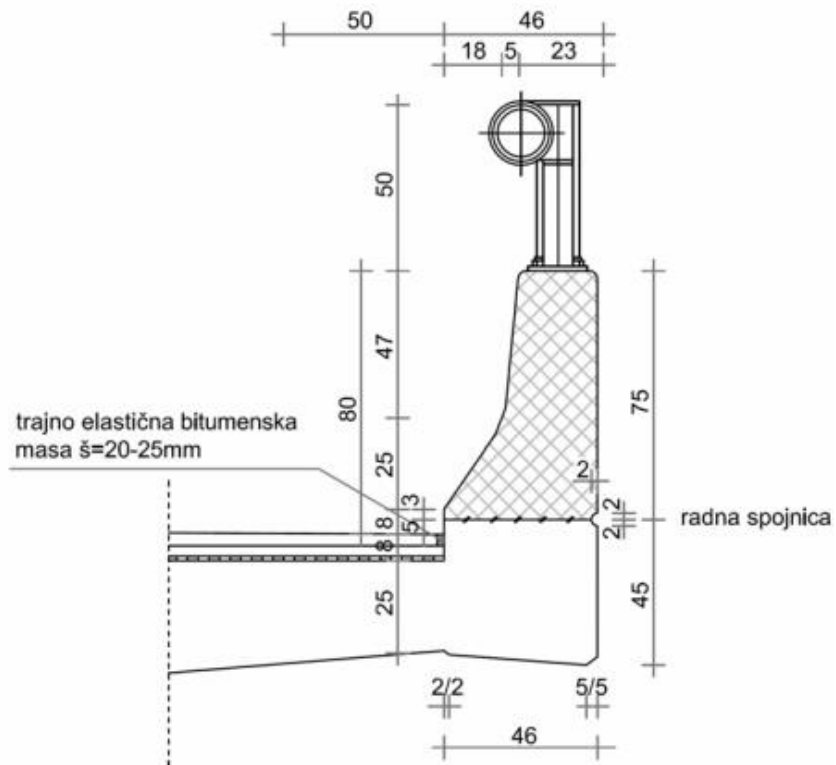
External monolithic New Jersey barrier - height 80 (110 cm) [5]
